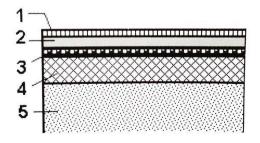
TYPE D area system in sections: 1= floor covering, 2= load-bearing and heat-distributing layer (screed), 3= surface element, 4= insulating layer, 5= building construction of floors (2, 3)
